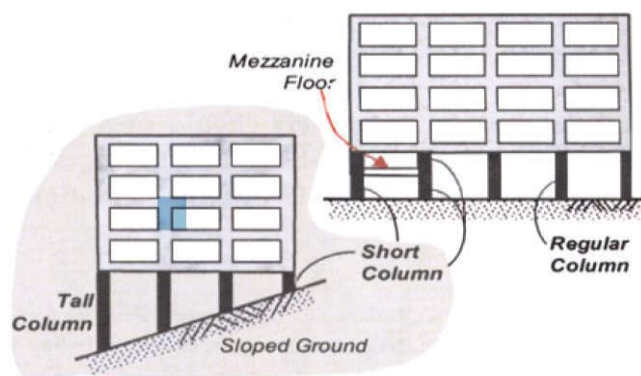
short columns in buildings on a sloping ground and buildings with a mezzanine floor
